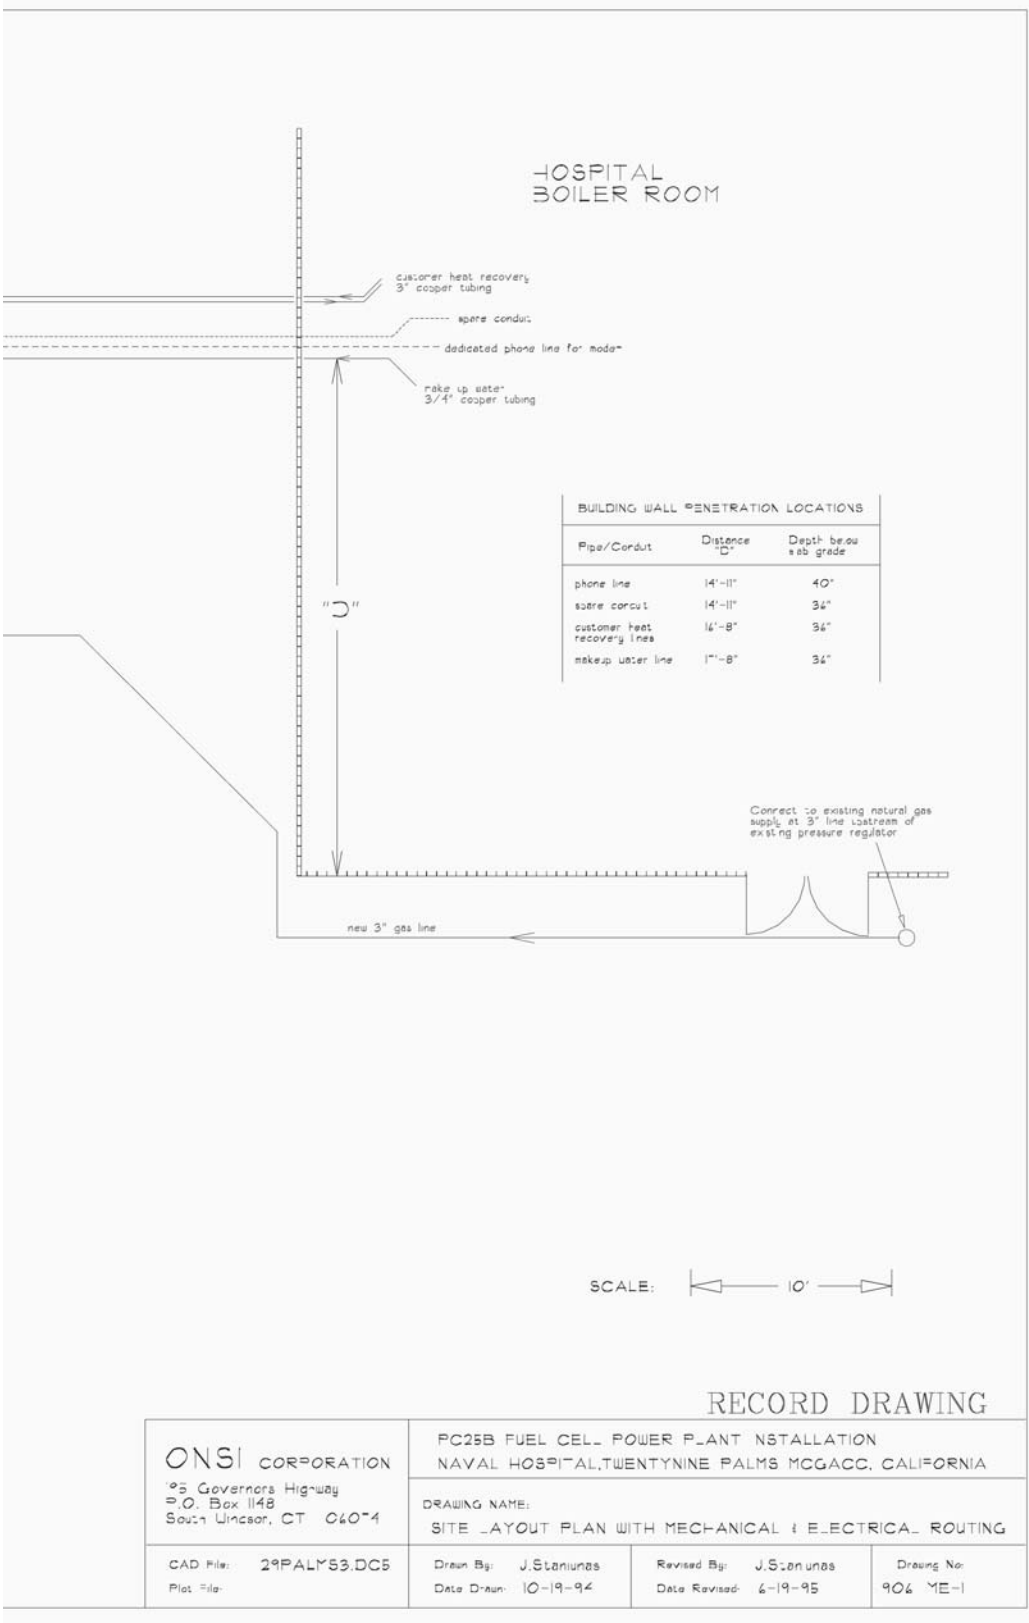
Final installation drawing – layout plan with mechanical and electrical routing.
